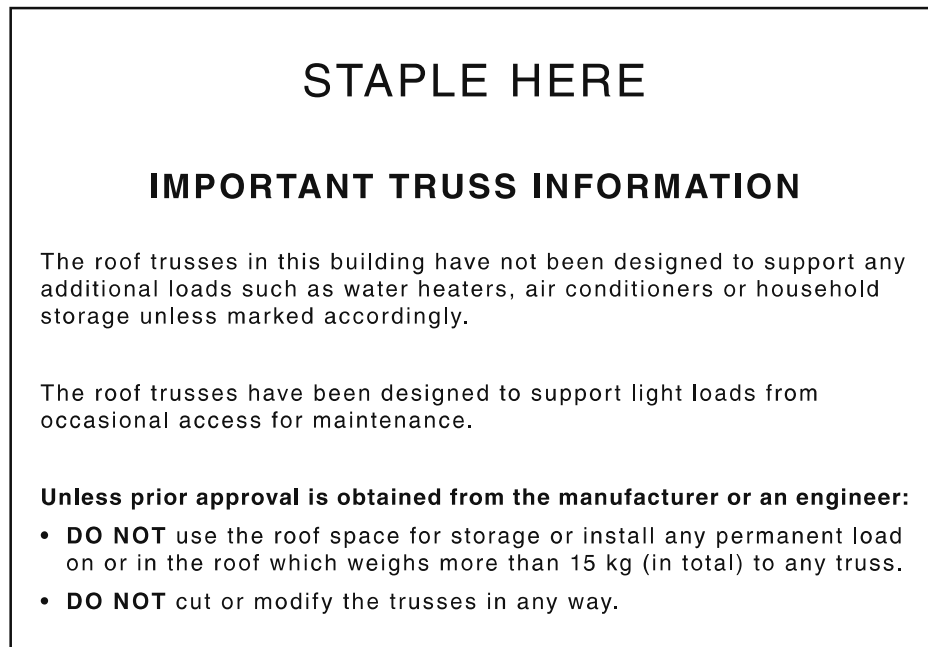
EXAMPLE OF TRUSS APPLICATION WARNING LABEL
